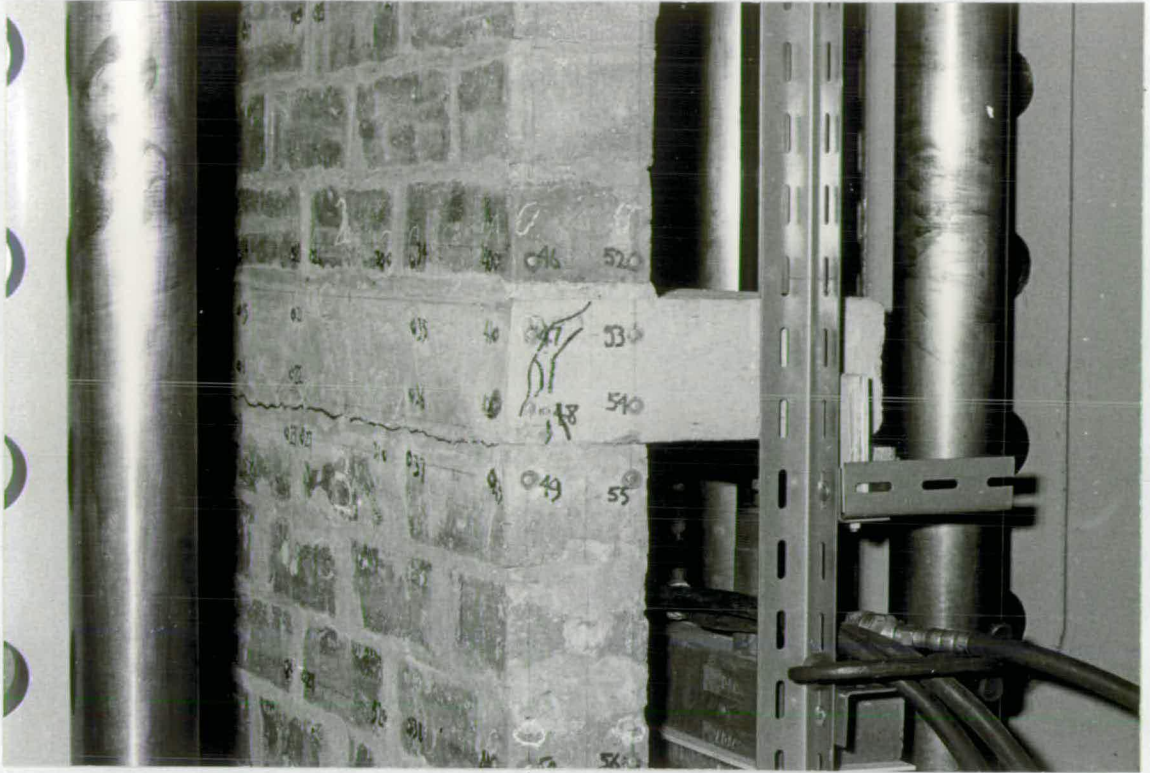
Shear Failure in the Slab Round the End Reinforcement.
